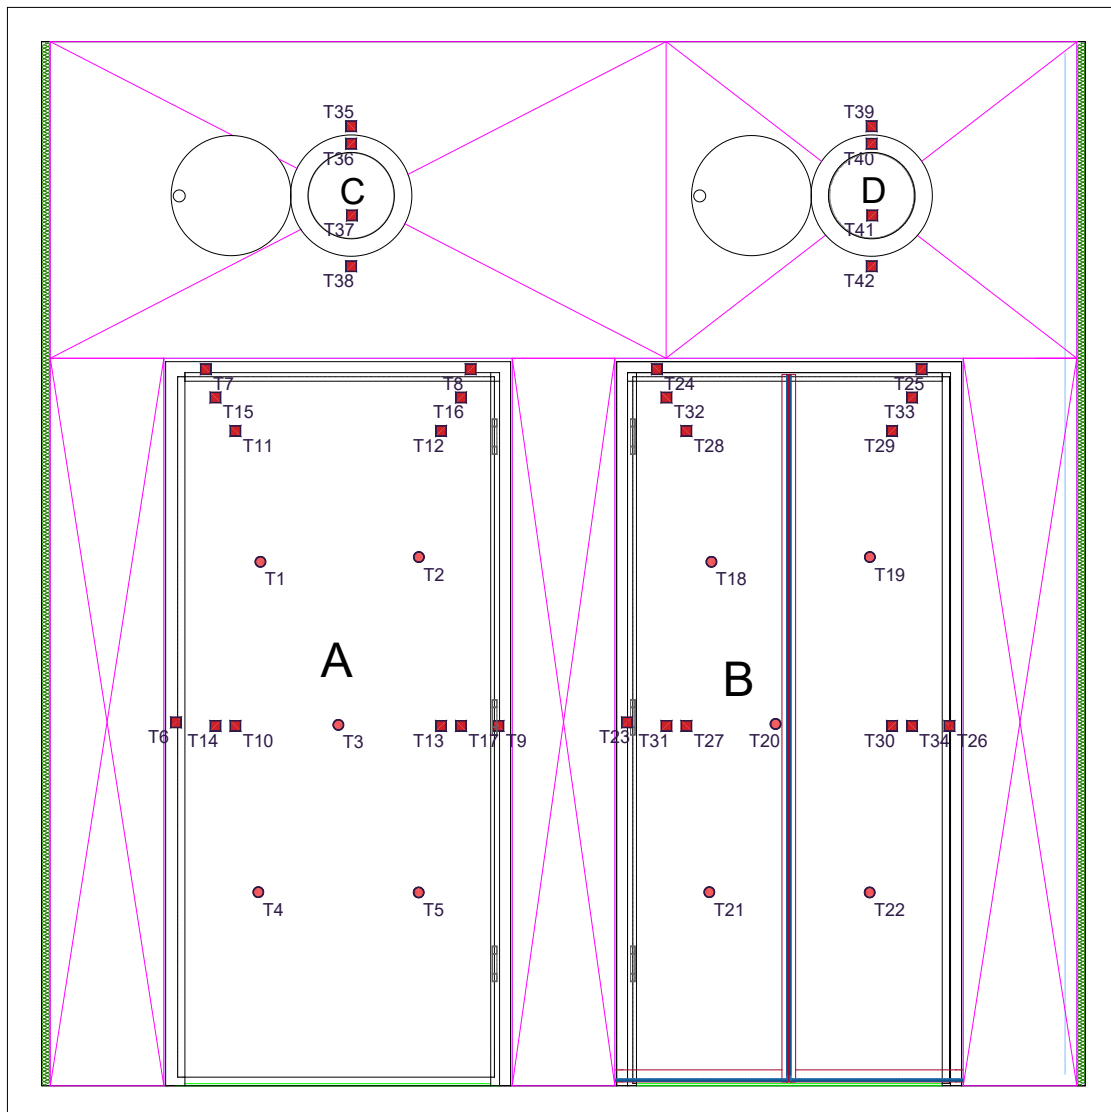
Layout of instrumentation viewed from the unexposed surface of the test construction
